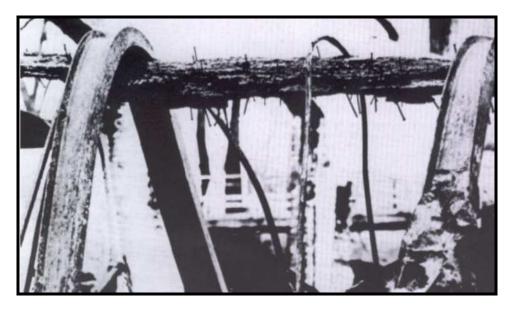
Steel beams have melted and collapsed over charred glulam beam which, despite heavy damage, remains in place (Glued Laminated Timber Association, document on-line).
